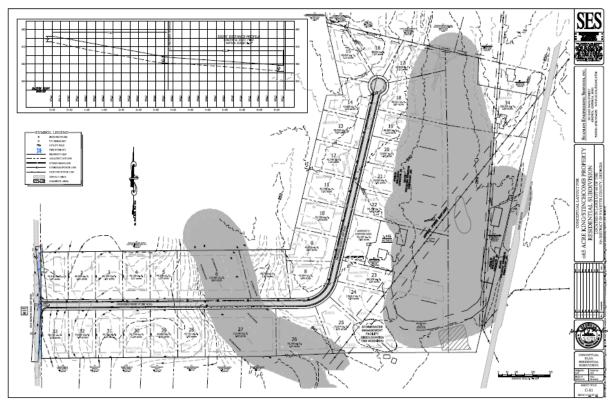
Concept Plan (Also attached as Attachment "A")
